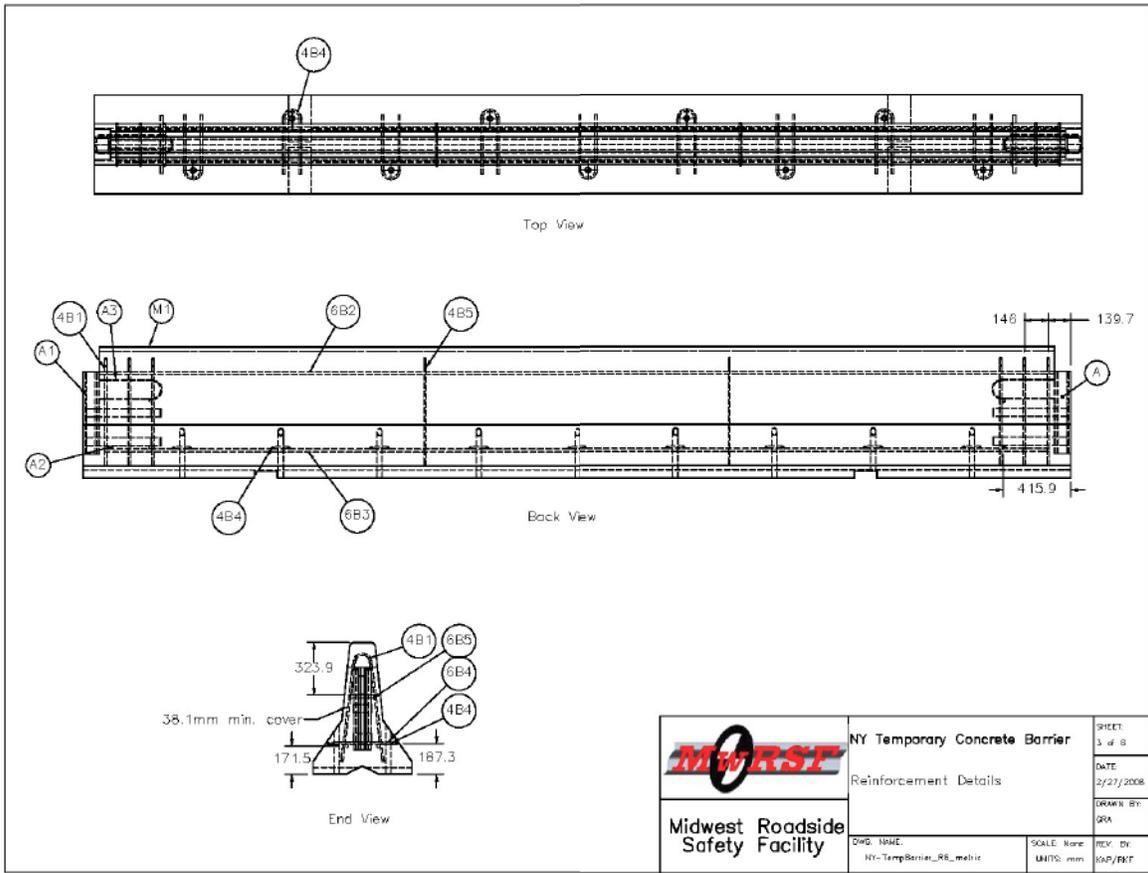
Temporary Concrete Barrier Reinforcement Details, Test NYTCB-2
